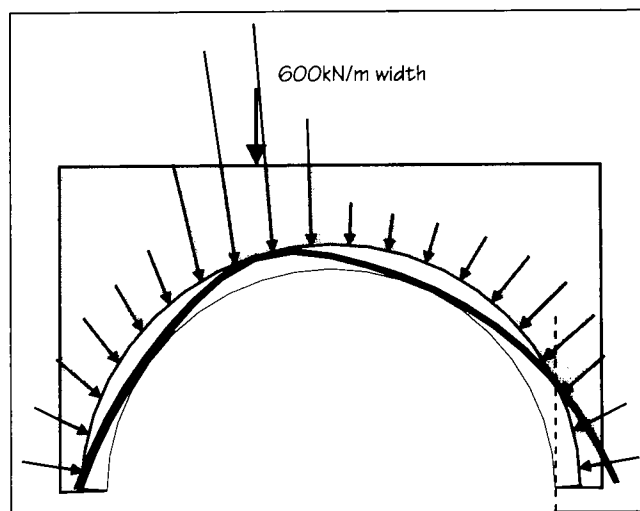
Assuming minimum masonry backing for bridge at Bargower.
